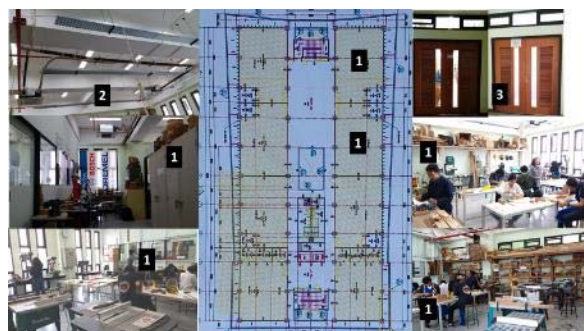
Light and colour and acoustic . Denah 7th floor CADL-ITB
